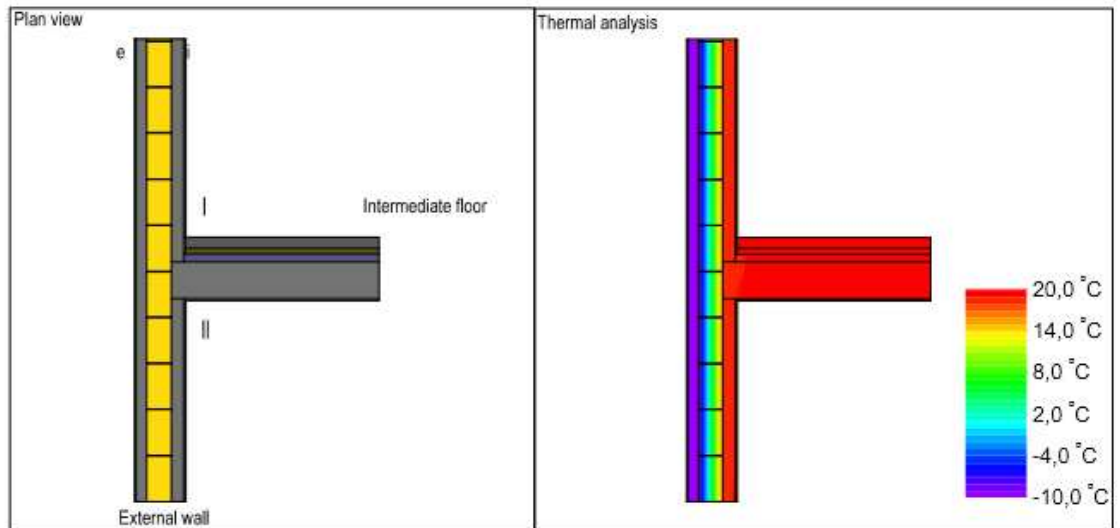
Brick masonry lay-up with reinforced concrete intermediate floor.
